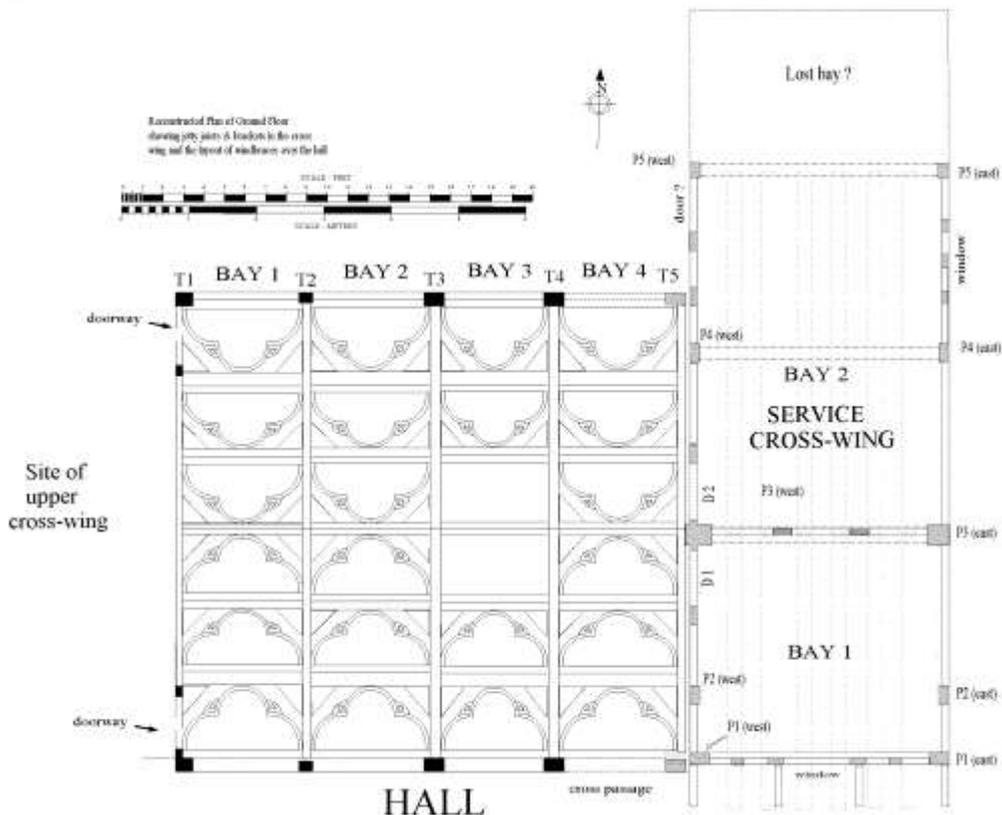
Plan of Swan House and School View, Pembridge, showing the windbraces
